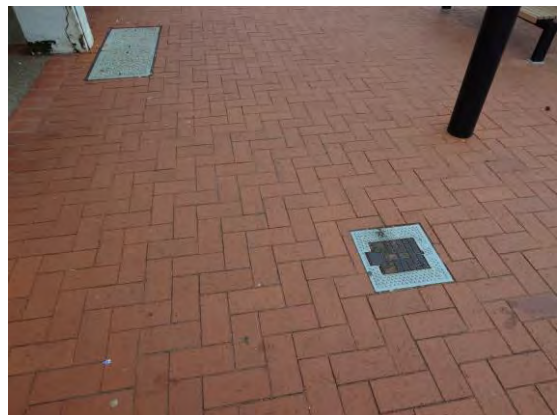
Existing Fire Hydrant in Central Carpark (north)
